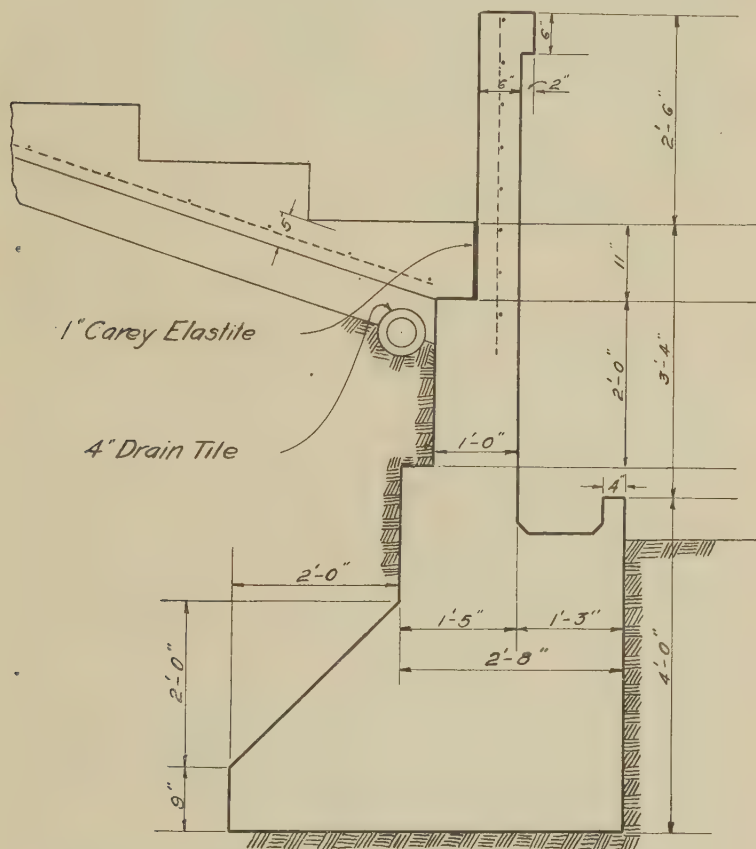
PARAPET WALL SUBJECT OF OBSERVATIONS.
